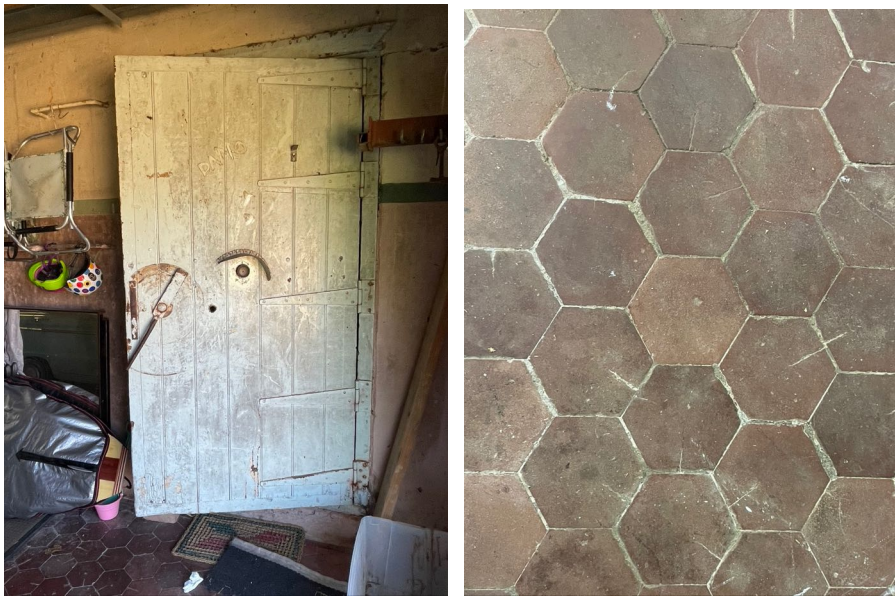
Original coolroom door at left and hexagonal tiles at right, which will be retained.
